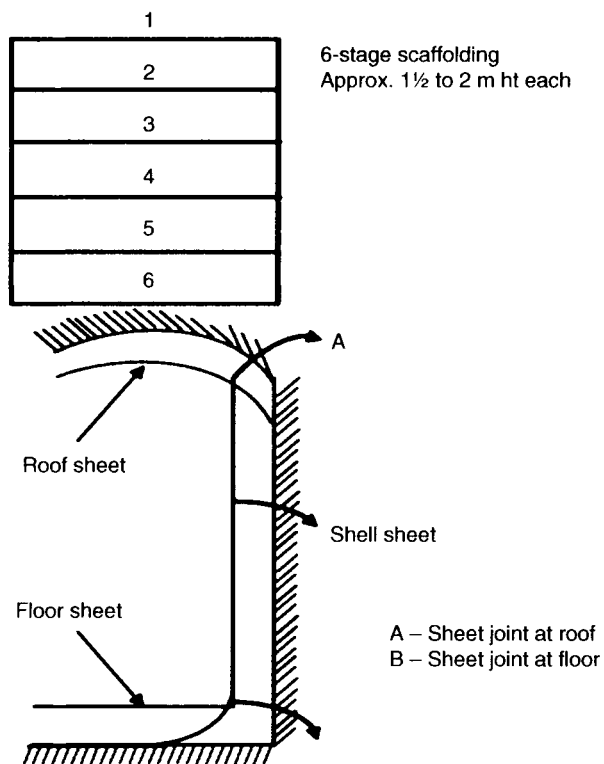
Schematic diagram showing sheet joints at roof and floor of tank.
